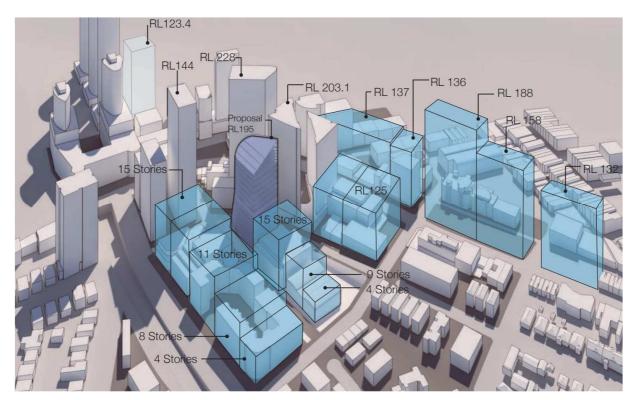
Heights of surrounding development proposed under the Draft 2036 Plan
